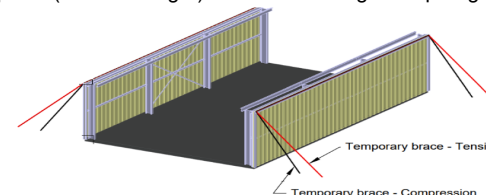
Frame First Temporary Bracing on First Rafter Installed Fig 2. Temporary Bracing Installed as X Bracing
